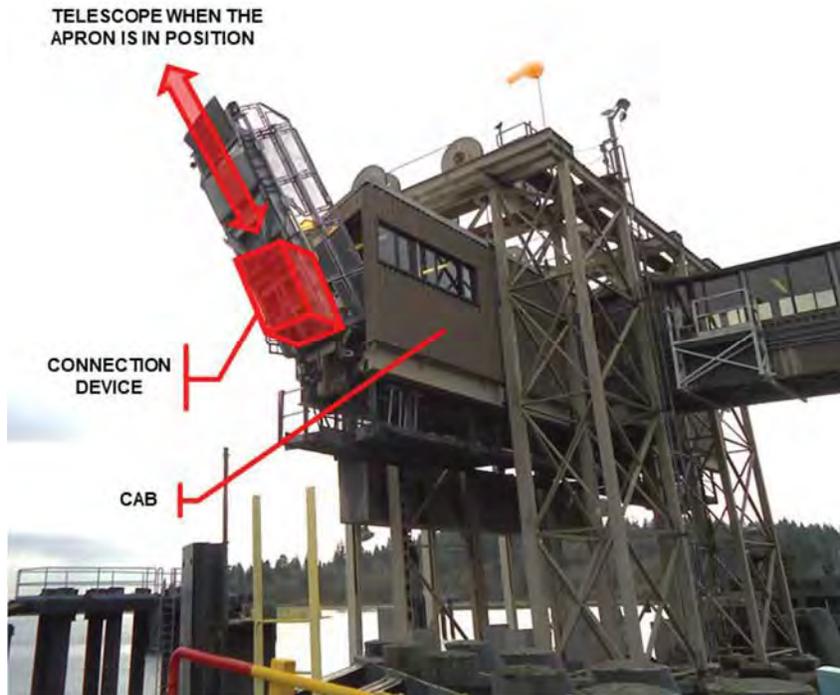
Passenger apron mounting arrangement sketch, Kingston terminal shown
